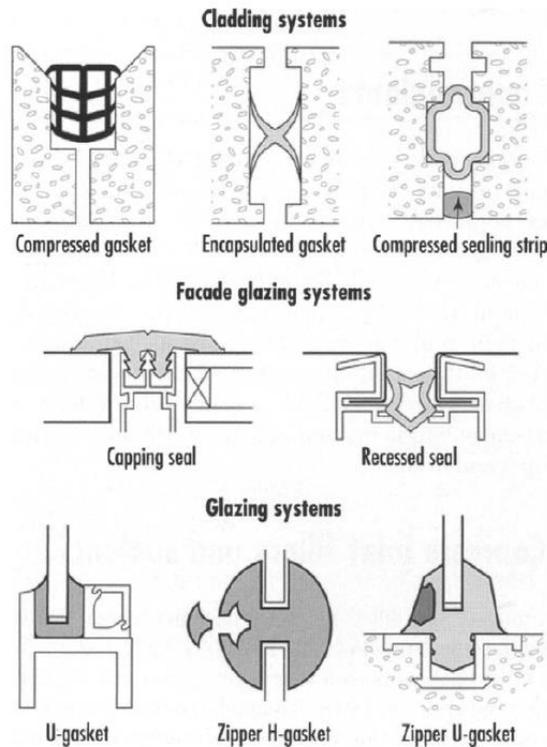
Types of the sealing of the gaskets based on the flange shape [18]
